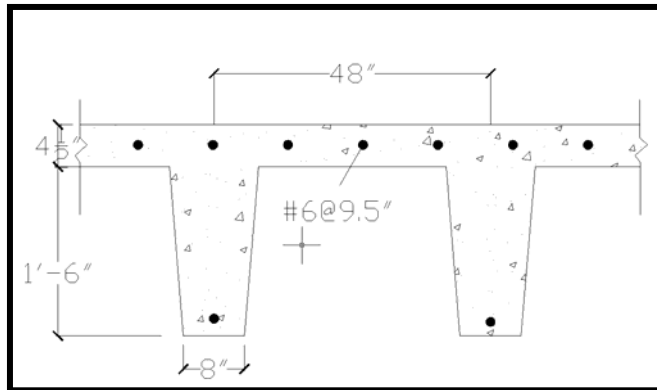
Typical bay layout for one-way concrete joist system, long span
